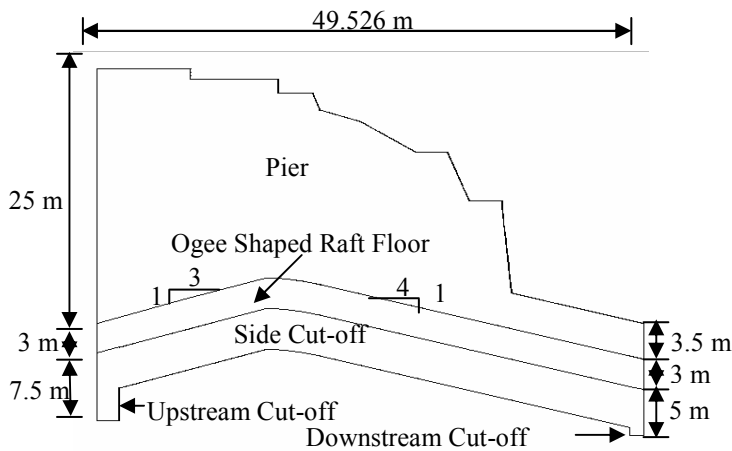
Longitudinal section along the pier, raft floor and cut-off of the barrage bay
